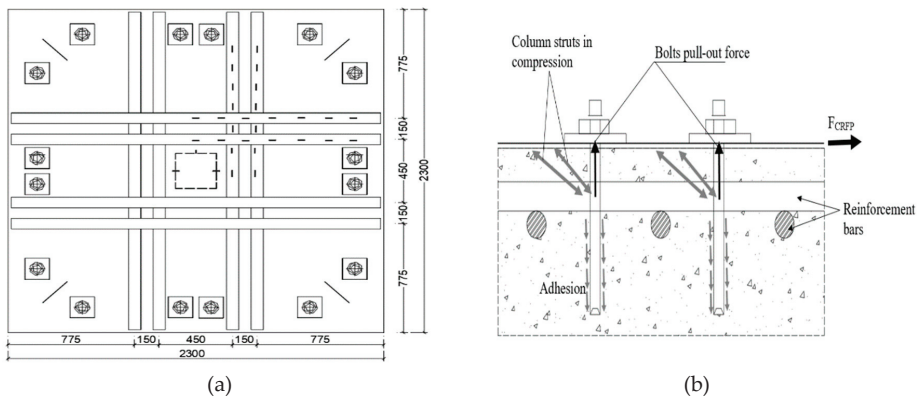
(a) Specimens with 8 strips bonded to the tension side with M10 anchor bolts and (b) anchor bolt failure mechanisms [35].
